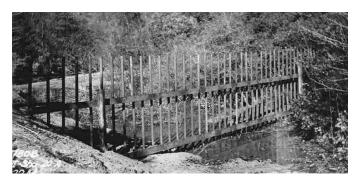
Post and Rail Debris Rack Installed 100 Feet Upstream of Culvert
